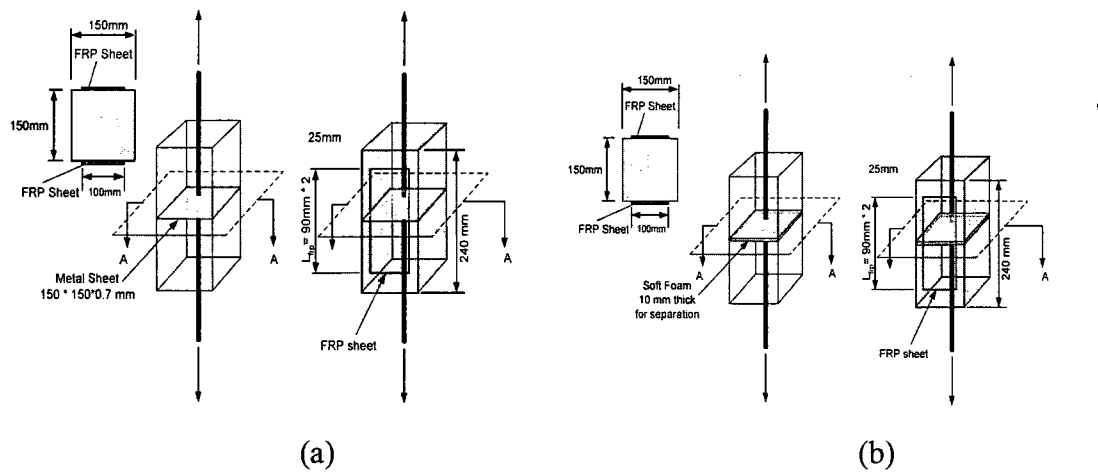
The test specimens setup schematic view for: (a) Specimen #4-1 Entirely Separated thin Sheet + Wrapping(240mm) (b) Specimen #4-2- 10 mm Foam between Separated Sections(230mm)
